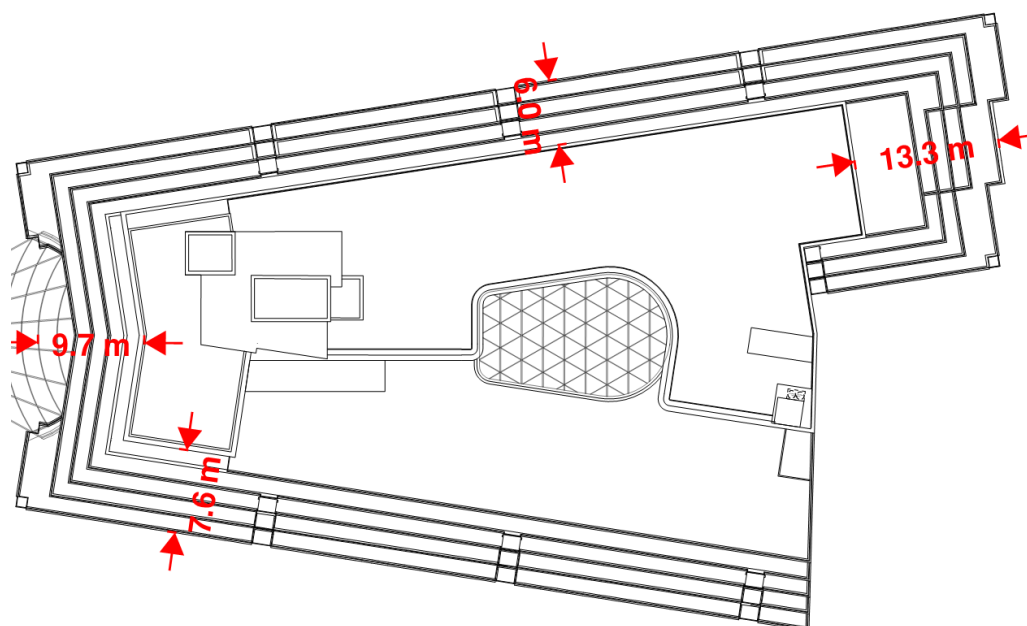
Roof of the South building showing how it sets back from the façades on the lower floors
